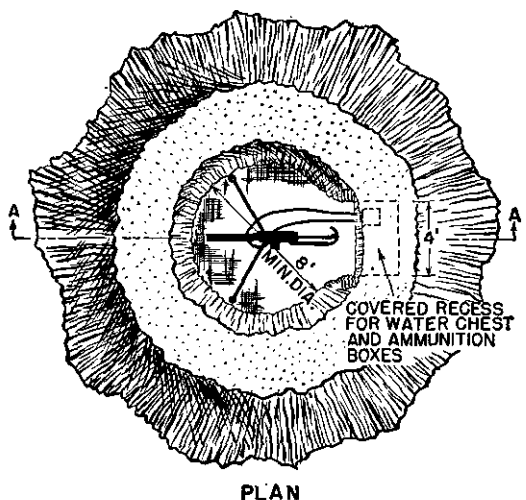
Emplacement for caliber .50 machine gun, water cooled, M2, on M2A1 mount. (Camouflage omitted.)
